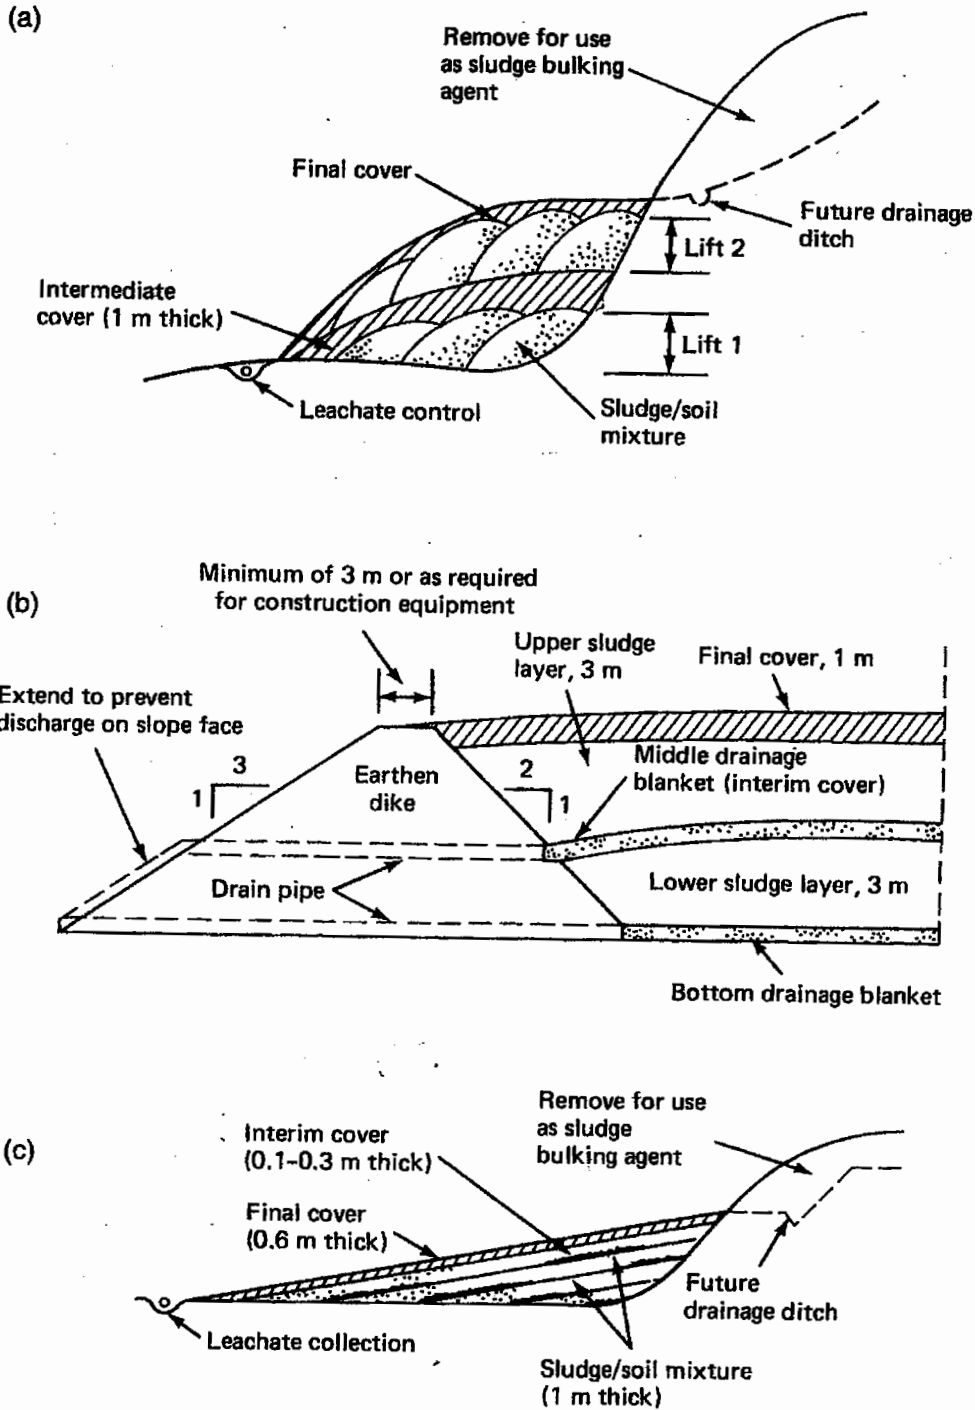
Design Details of Sludge Landfill by Area Fill Method: (a) cross section of typical area fill mound operation, (b) cross section of typical area fill layer operation, and (c) cross section of typical dike containment operation (from Ref. 1).
